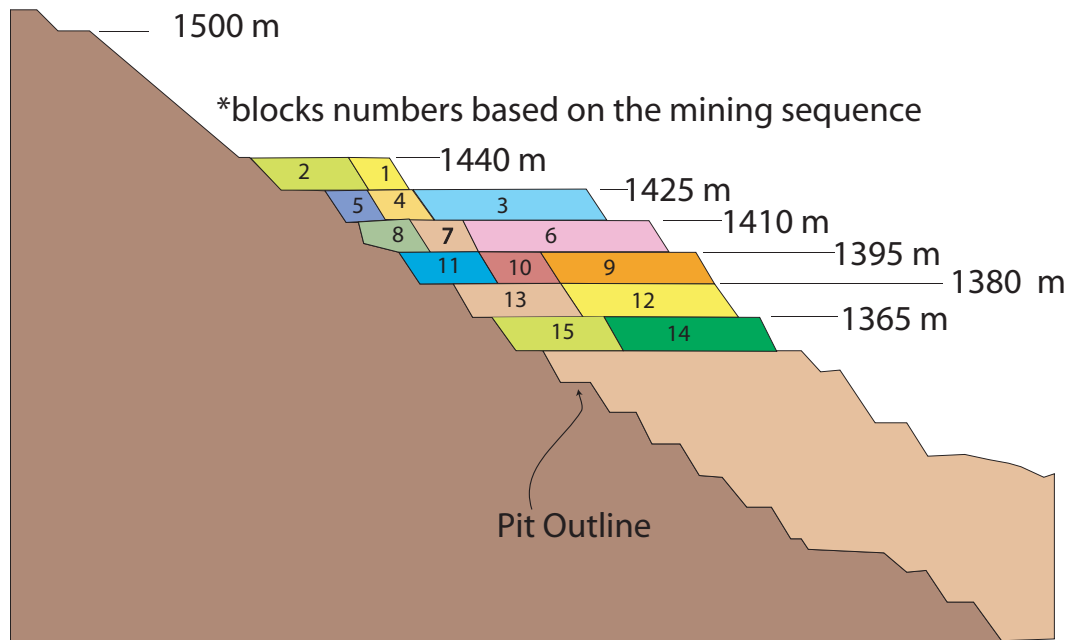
Blocks excavation sequence at Lornex southeast wall
